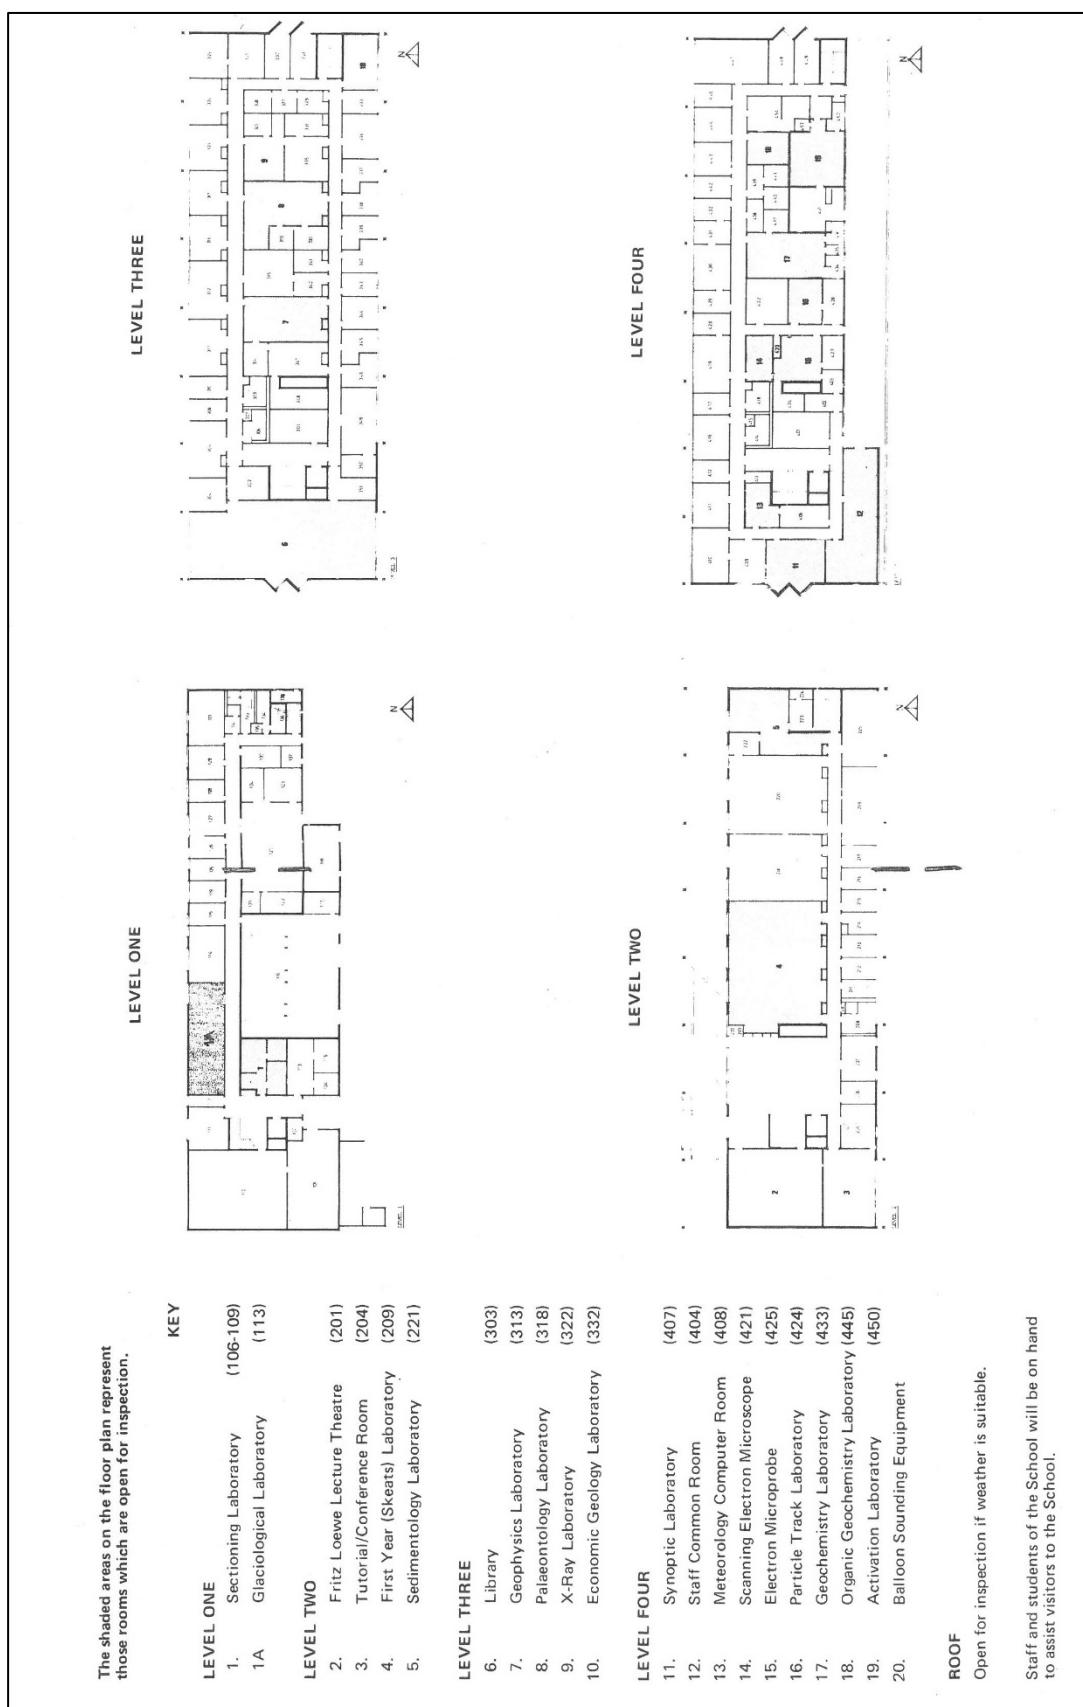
Floor plan of the subject building's interior plans and layout, 1977
